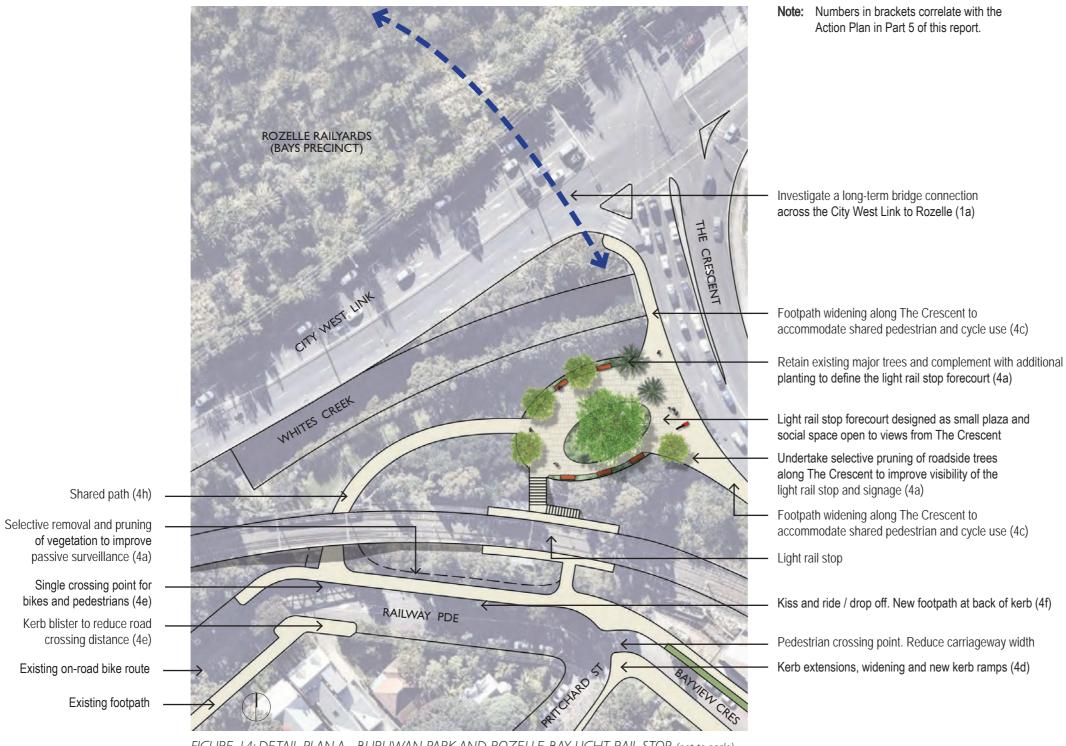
DETAIL PLAN A - BURUWAN PARK AND ROZELLE BAY LIGHT RAIL STOP (not to scale)
